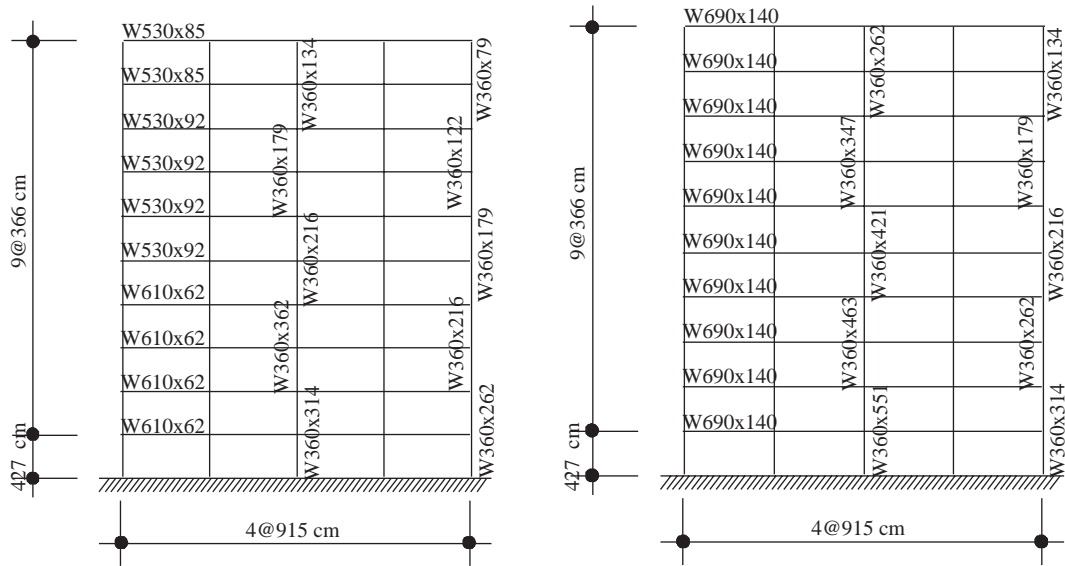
Elevation and member sizes of the 10-story building (Case 2).
